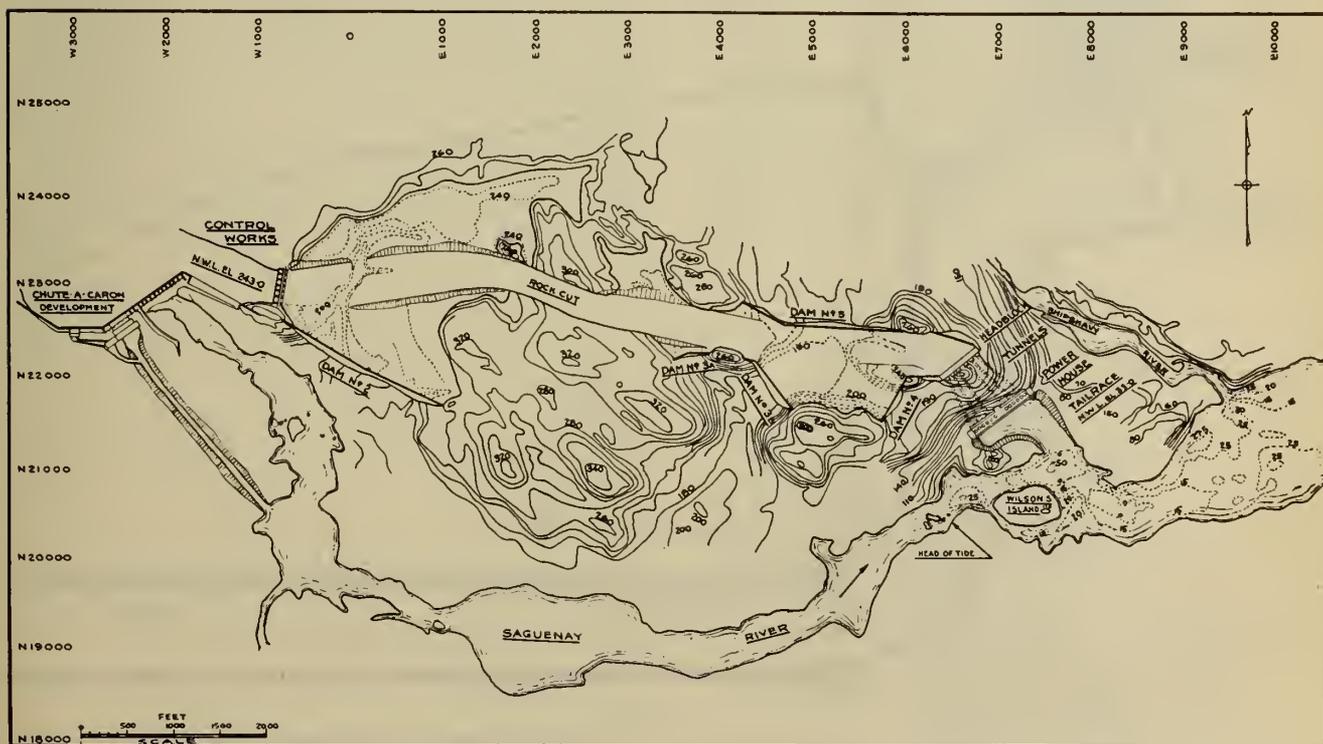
General layout of Shipshaw Development scheme as actually constructed.
